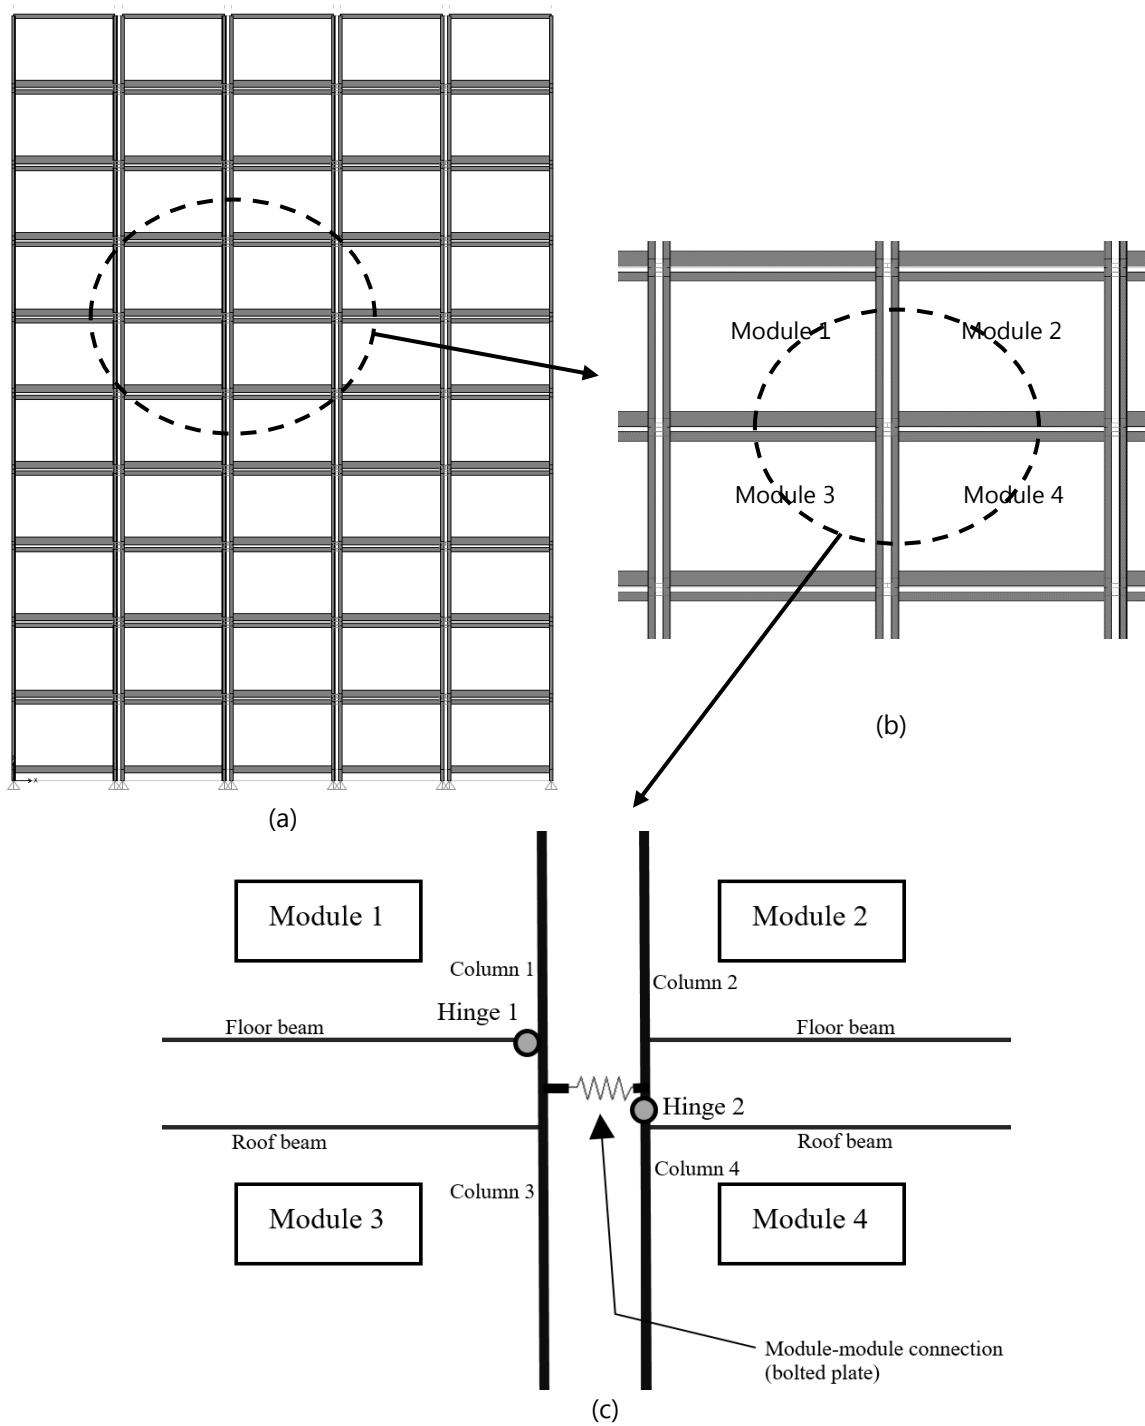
6. An illustration of the module-module connection and possible hinge locations via (a) the view from the front elevation of the modular building, (b) a close-up of the elevation view of neighbouring modules and (c) the module-module connection
